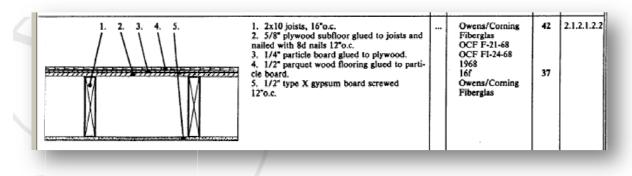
STC and IIC Ratings for 2 x 10 Wood Joist Floor-Ceiling Assembly
